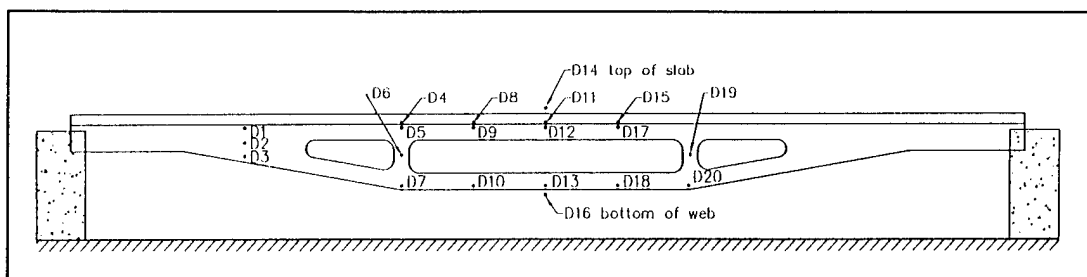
LVDT locations on test specimens HJ-5, HJ-6, HJ-7, and HJ-8.
